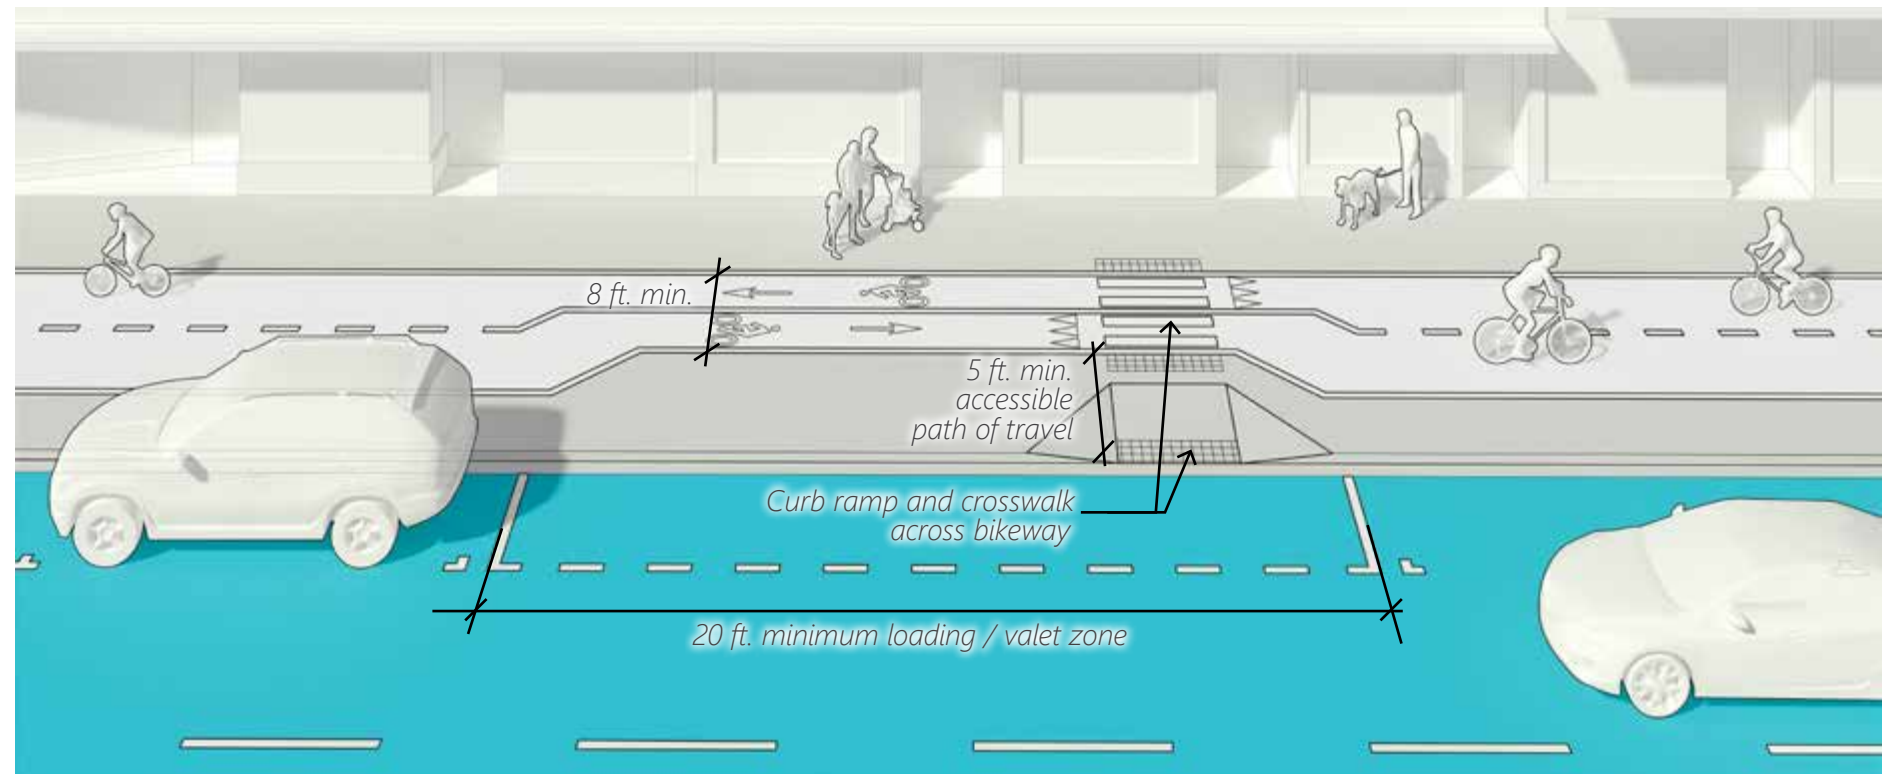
Two-Way, Sidewalk-Level, Class IV Bikeway at Loading or Valet Zone.
